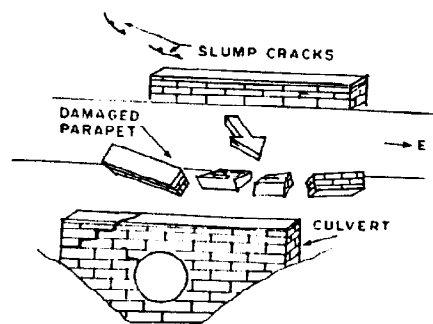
Collapse of a low parapet, shear cracks in the masonry culvert and cracks in rivulet bank.
